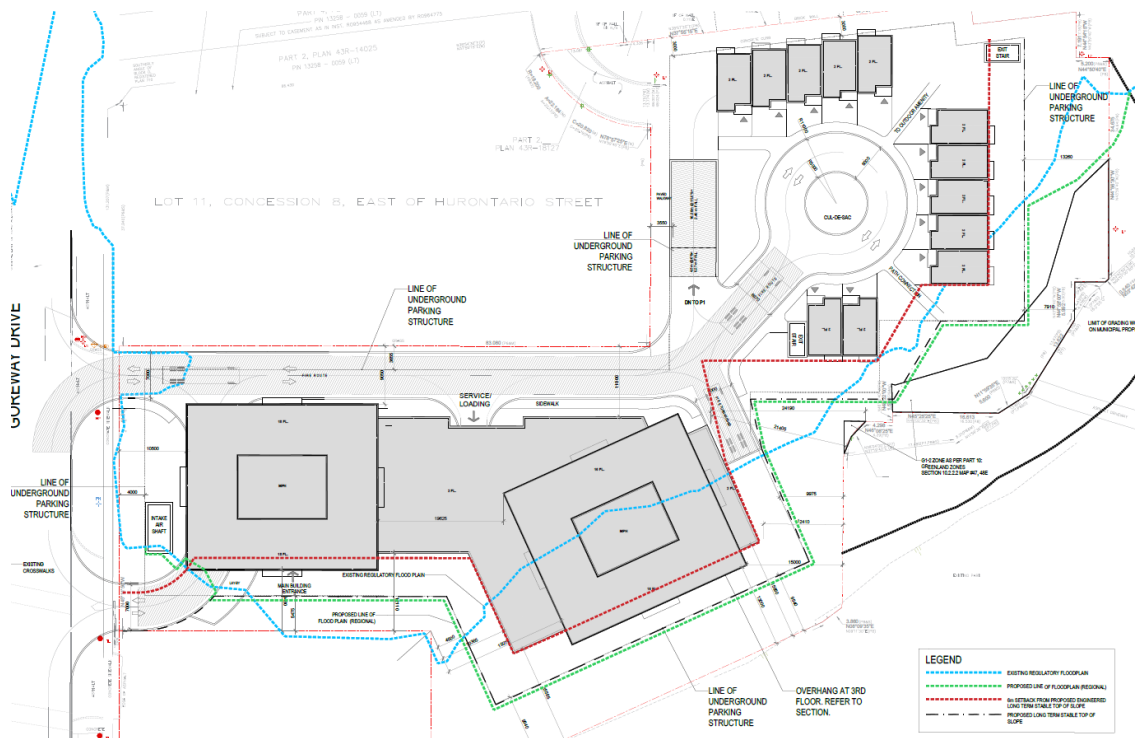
Proposed Development Concept Site Plan, Prepared by IBI Group
